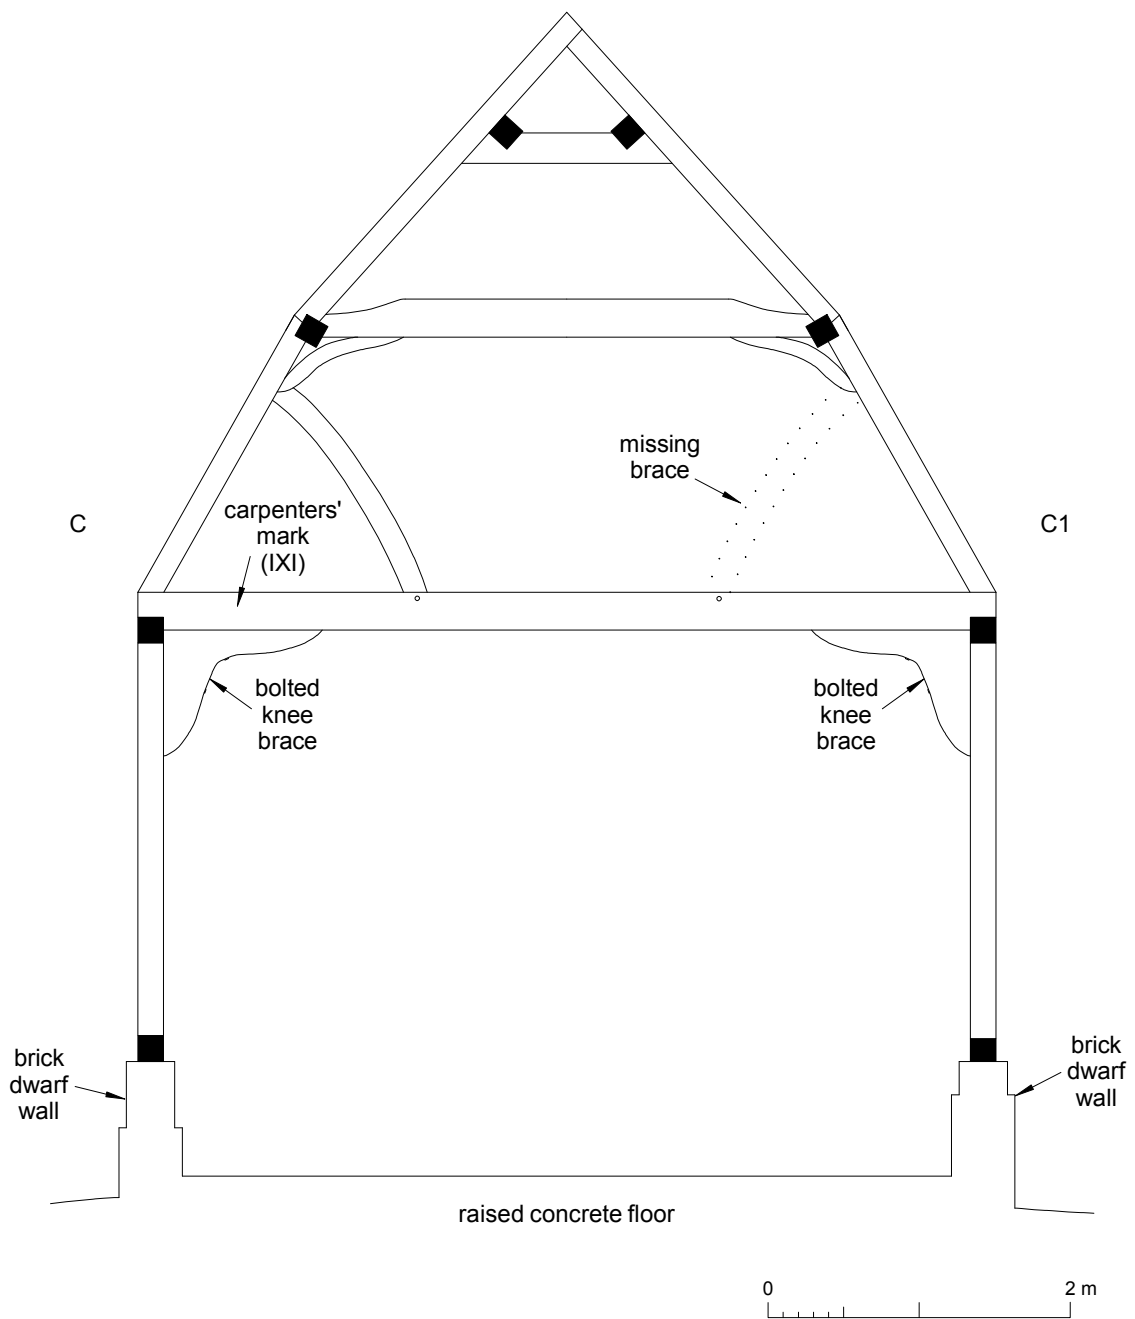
Barn 1, structure 1c: cross-section of truss C.
